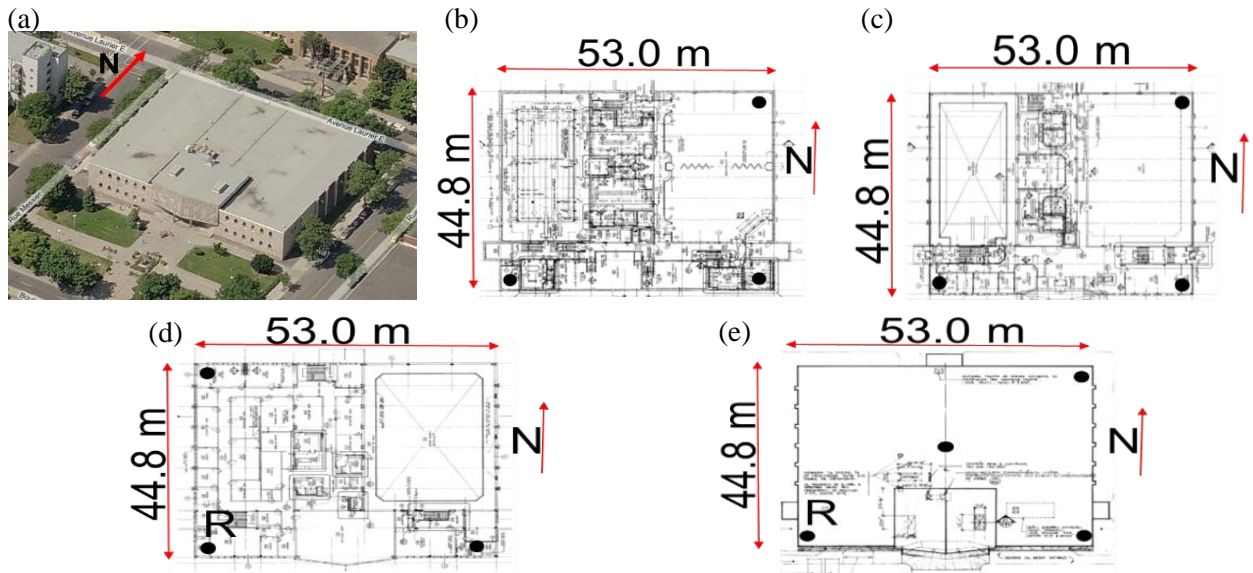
(a) Bird's eye view; (b) Basement - 4.7 m below ground level; (c) Ground floor; (d) 1st floor - height above ground 4.2 m; (e) Roof - height above ground 8.4 m
